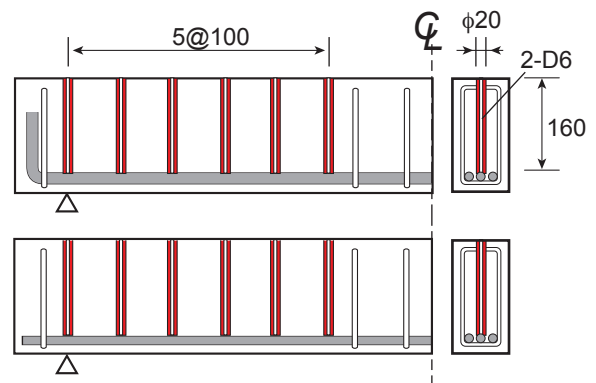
Shear strengthening for Series 0 specimens (unit: mm)
